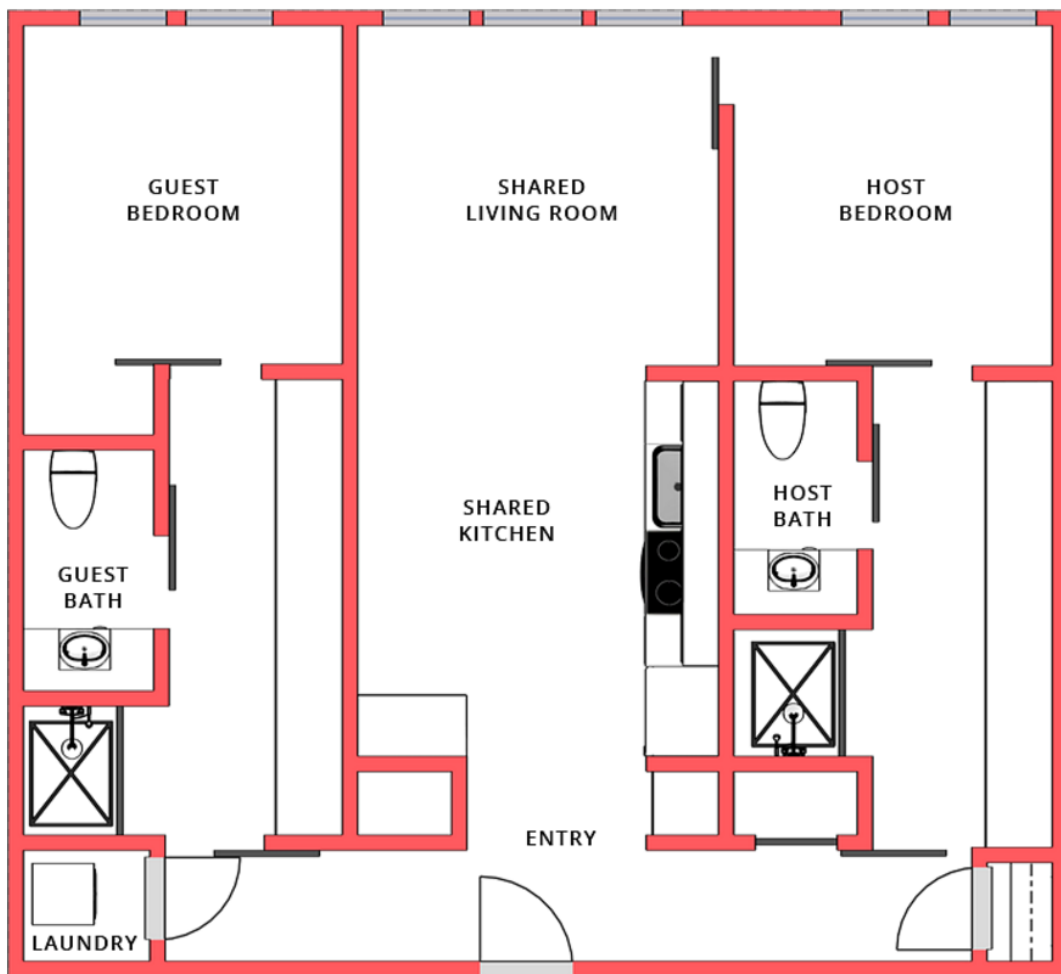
Airbnb floor plan provided by CubiCasa Oy
